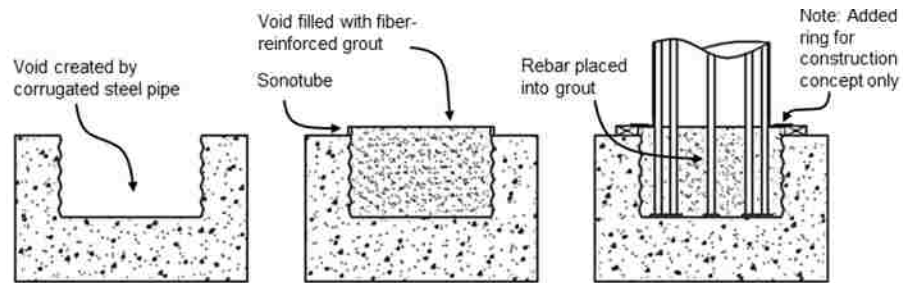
Specimens WRC, WRCUB, and RC Reinforcing Details
